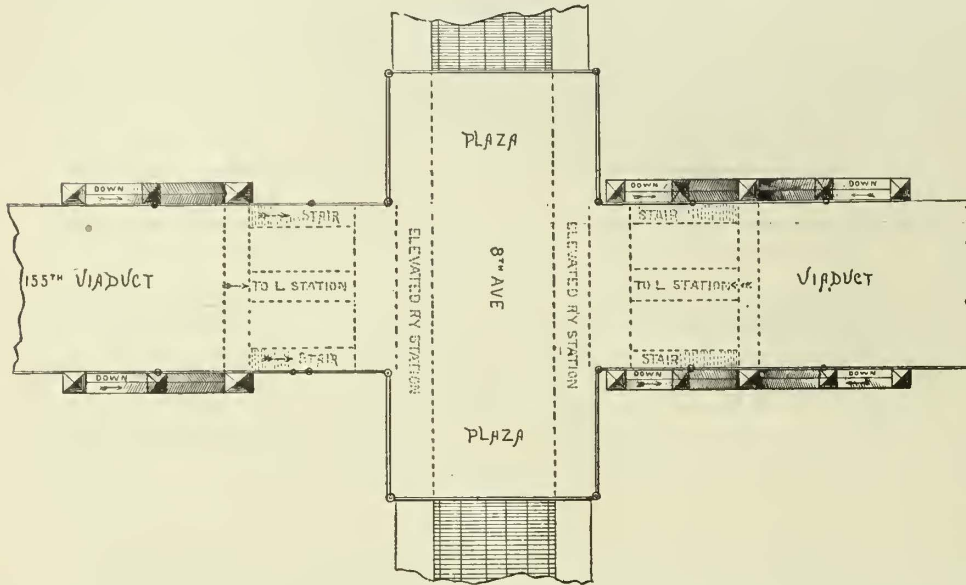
PLAN OF ELEVATED RAILWAY CROSSING—155TH STREET VIADUCT, NEW YORK.
